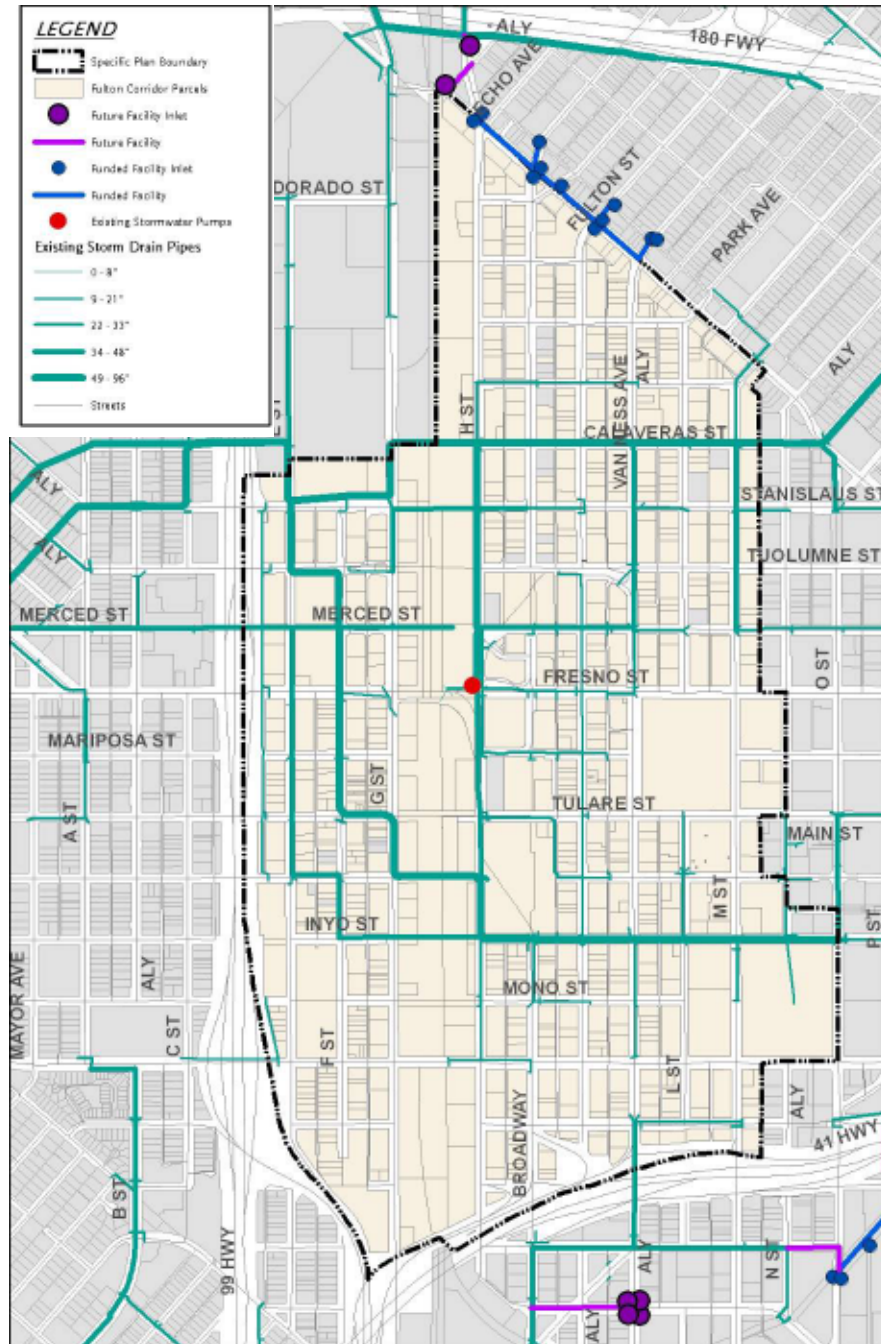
Existing Downtown Storm Drain System—Specific Plan Area
